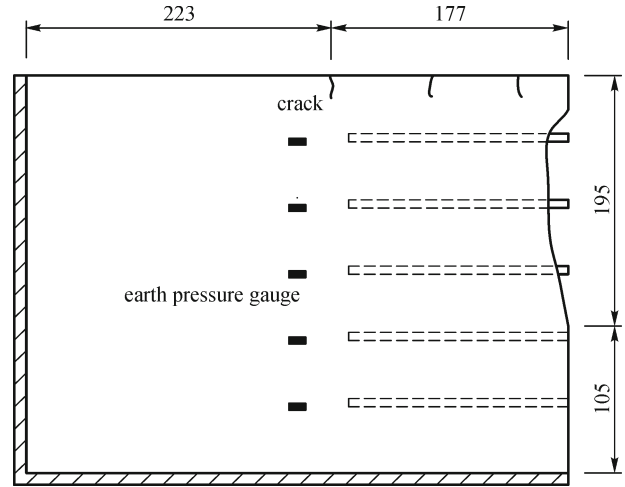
Final failure shape of A-A cross-section with bolt reinforcement in case 7 (unit: mm)
